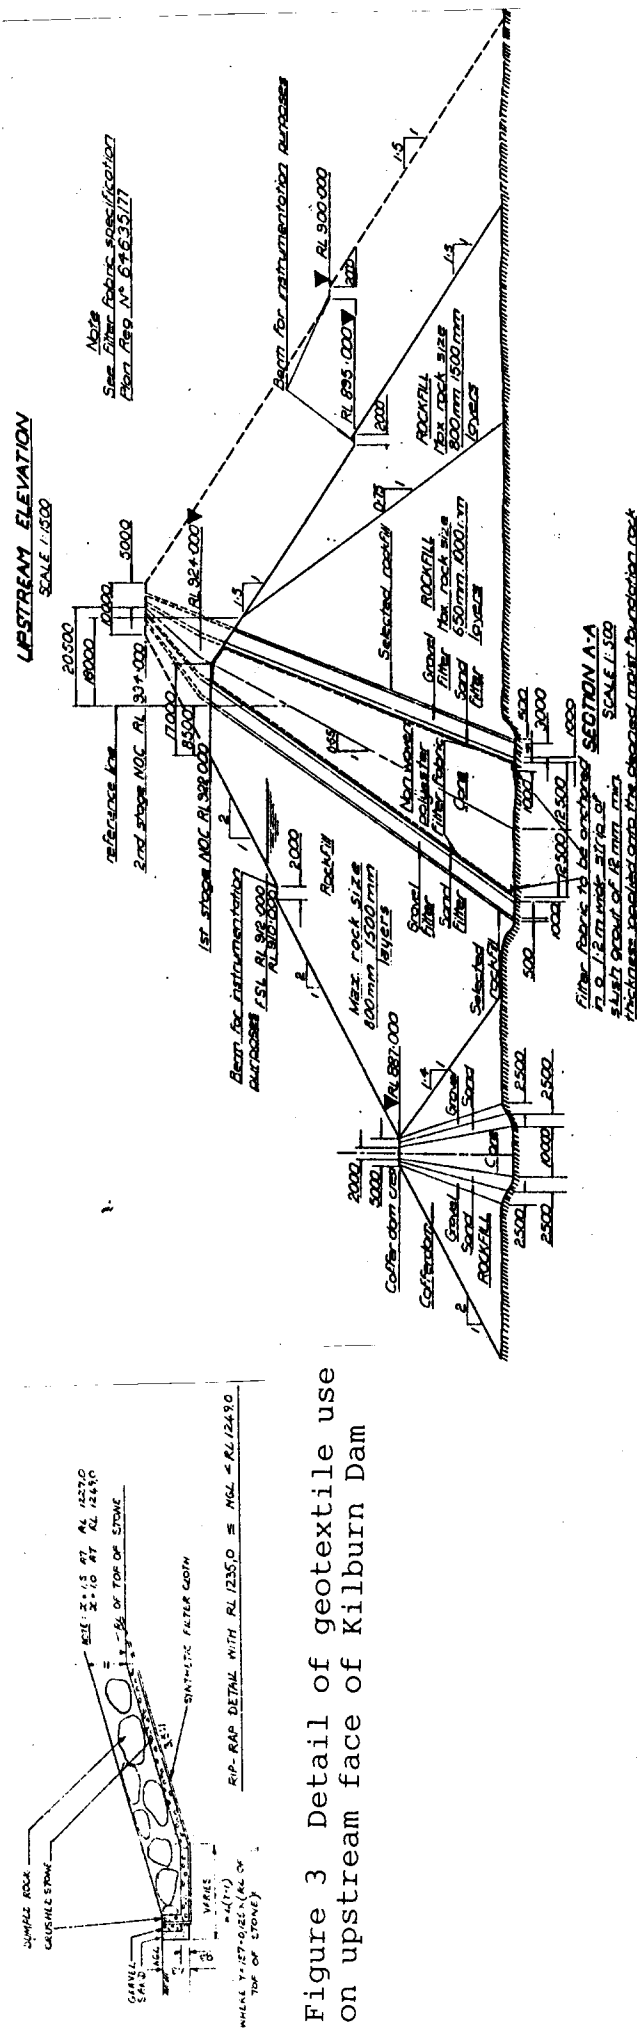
Detail of geotextile use on upstream face of Kilburn Dam
